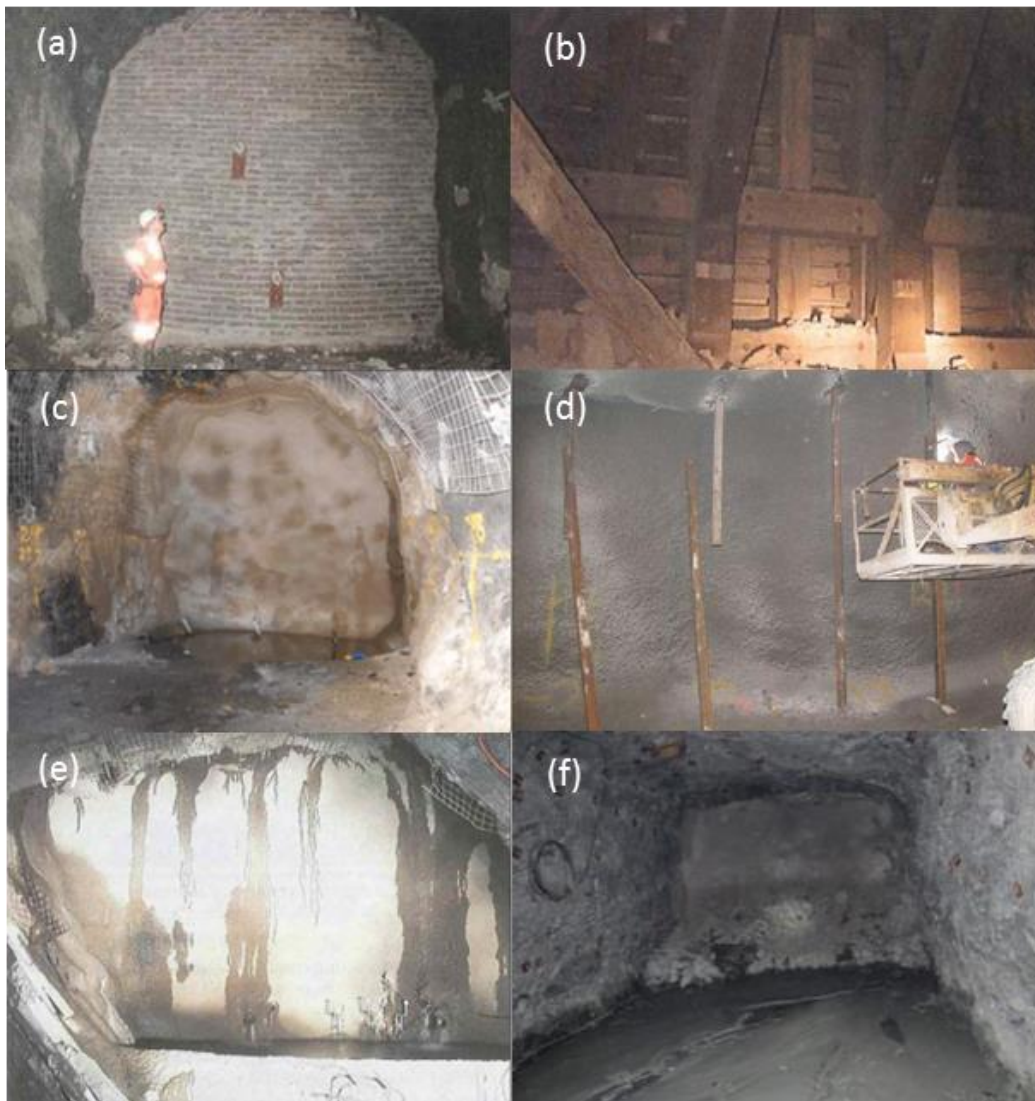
Typical barricades made of: (a) arched permeable brick wall ; (b) timber; (c) concrete; (d) shorcrete; (e) fibrecrete; (f) waste rock (a, b & e from Potvin et al. 2005; c & d from Grabinsky 2010; f from personal collection of Li Li)
